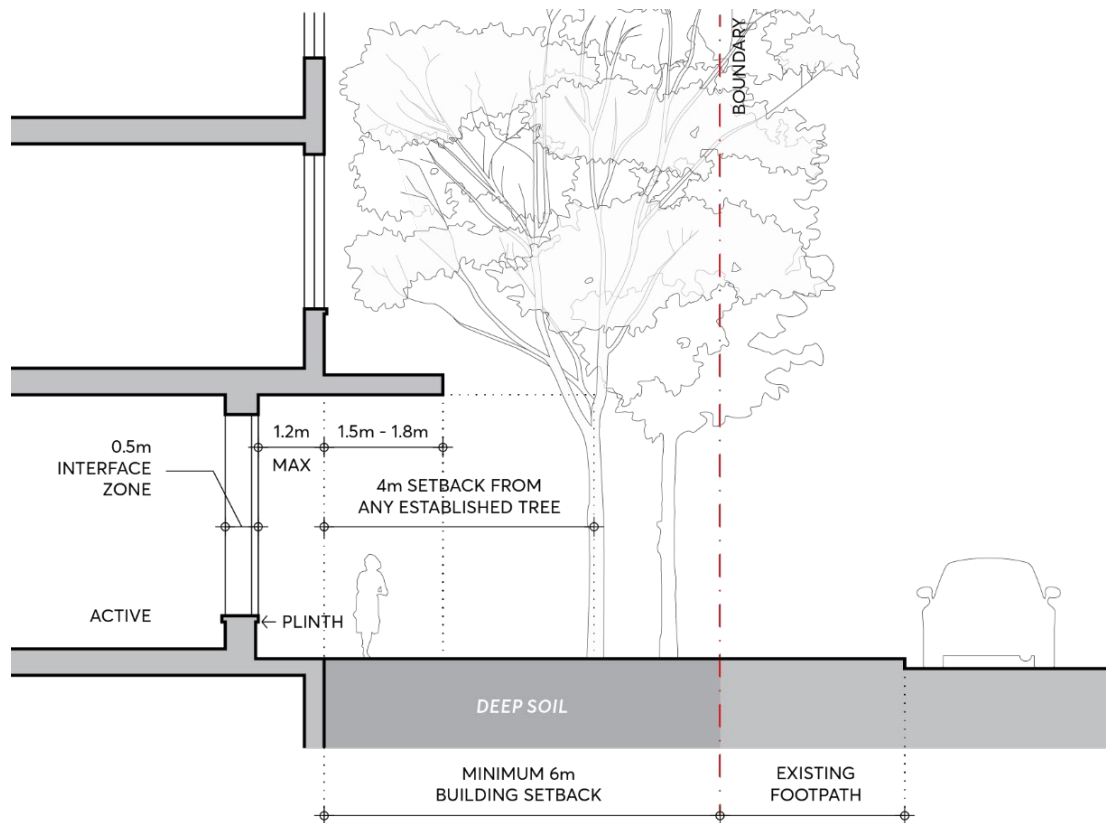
Great Western Highway Ground Floor Interface
